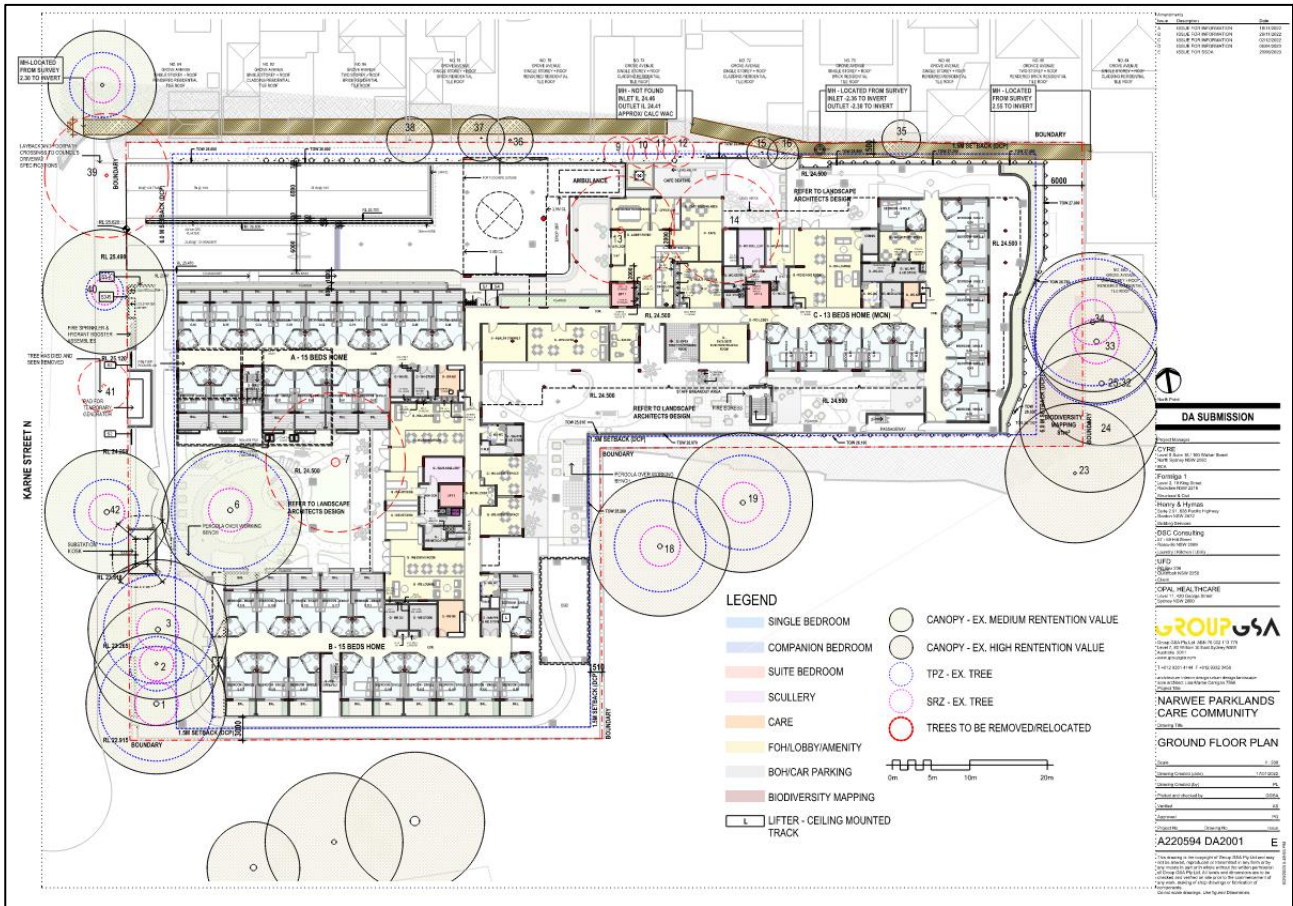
Proposed Architectural Plan (Ground Floor) – Group GSA
